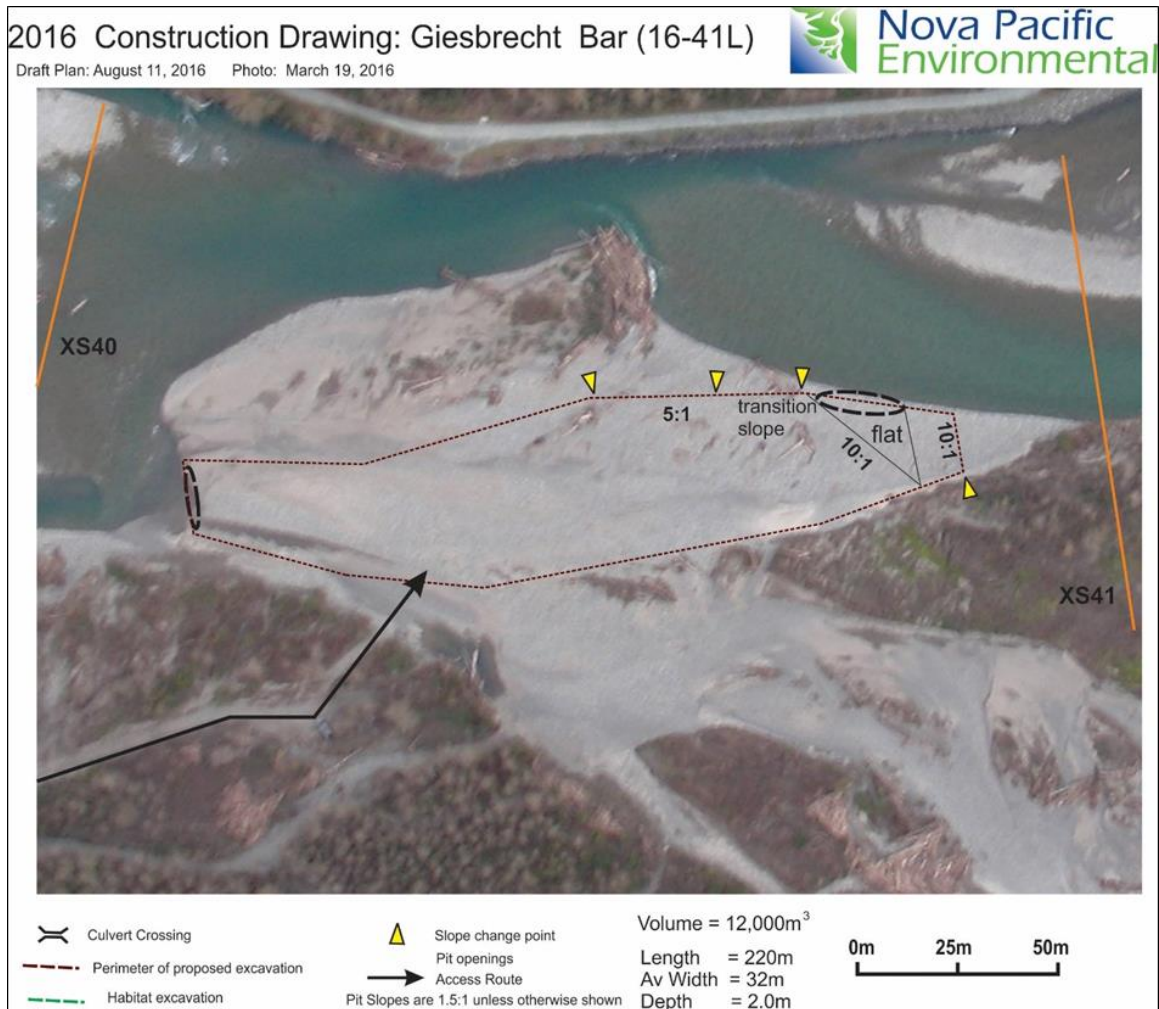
Aerial view of the Giesbrecht Bar excavation plan. Photo taken March 19, 2016, drawing rendered on August 11, 2016.
